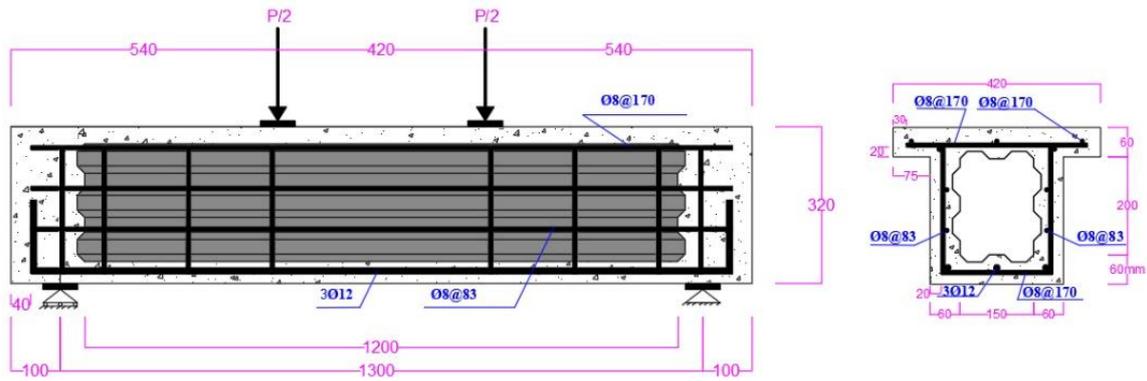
Dimensions and reinforcement details of (BSPSHC) (all units are in mm)
